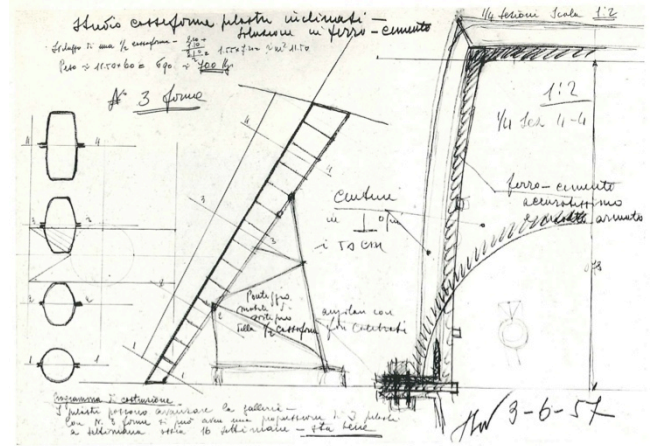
Sketch study of ferrocement formwork for Palazzo dello Sport columns [1]
